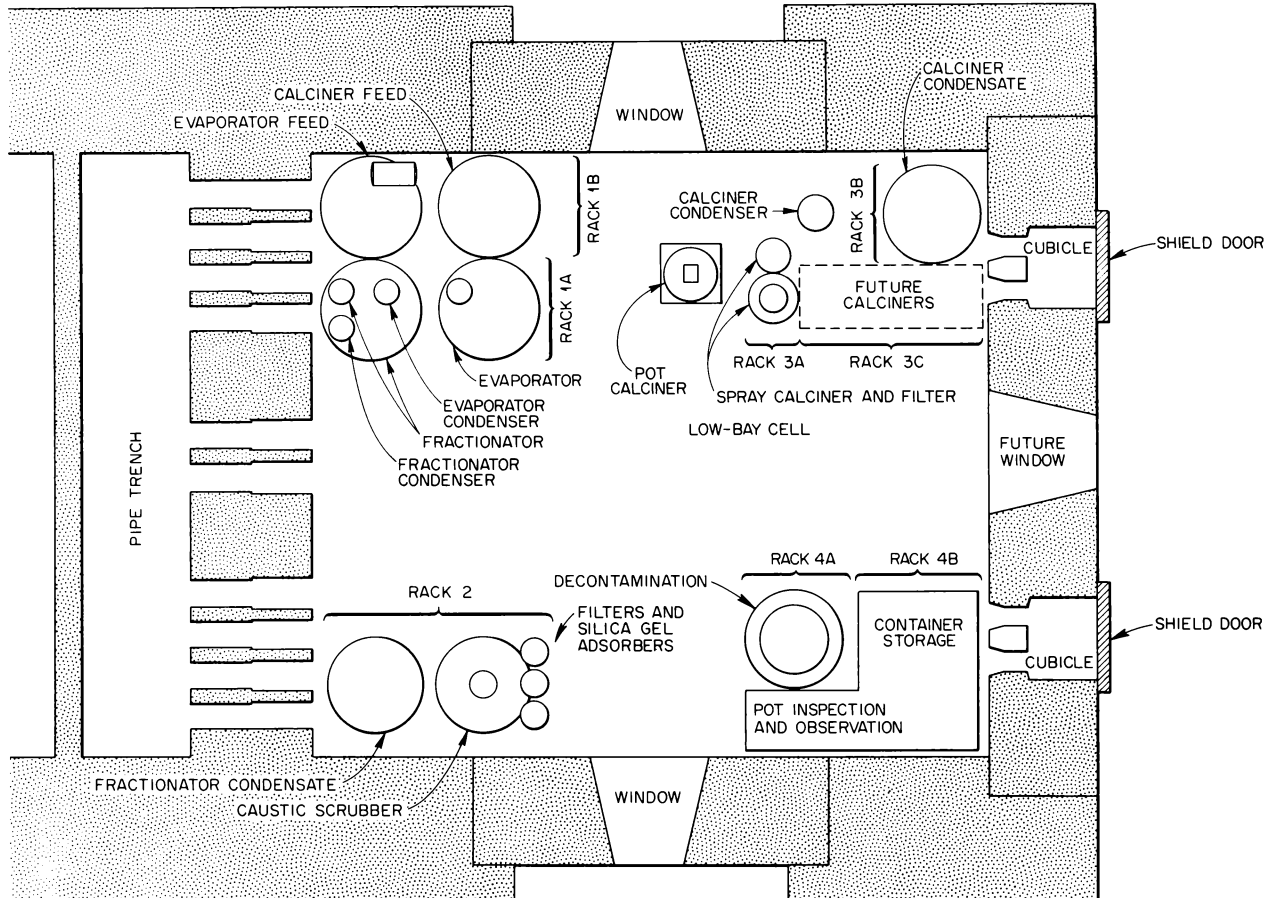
Hanford Pilot Plant: Vessel and Rack Arrangement.
